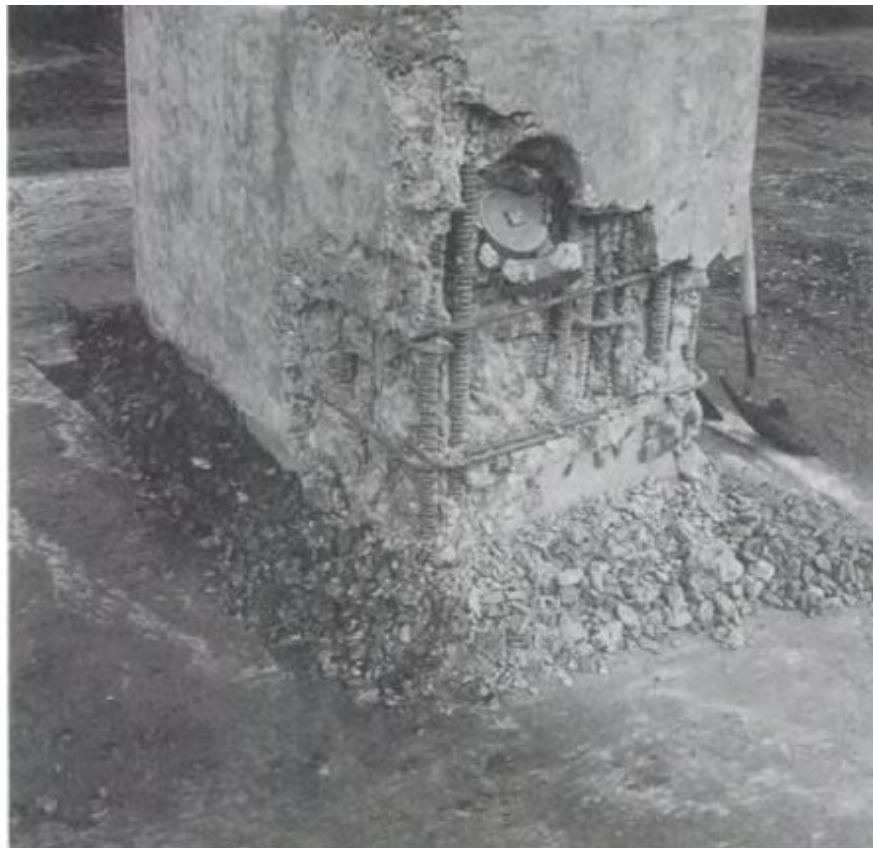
Bond failure of lap splices at column base, 1989 Loma Prieta earthquake (Adapted from Priestley et al. 1996).
